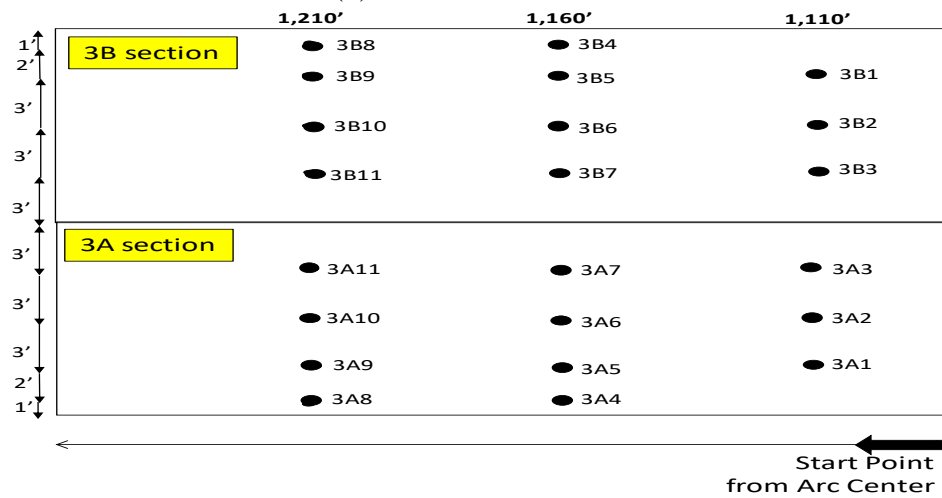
and Figure 52 show a total of 118 locations for each asphalt layer (86 locations in flexible pavement section and 32 locations in rigid pavement section). The cutting of 118 total cores for each asphalt layer was then performed at the testing locations. The lab measured each core's air voids and thickness. In addition, the GPS coordinate of each core's location was recorded to calculate the compaction index at those locations from the CMS.
